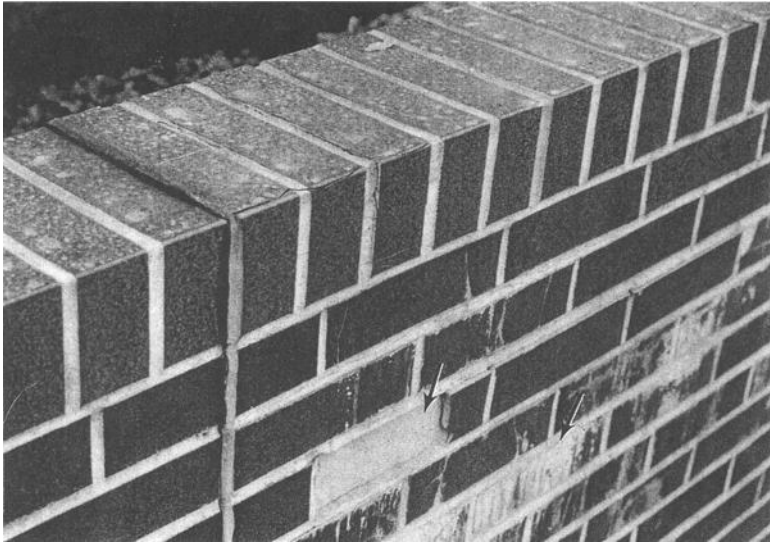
View of spalled glazed brick due to cryptoflorescence
